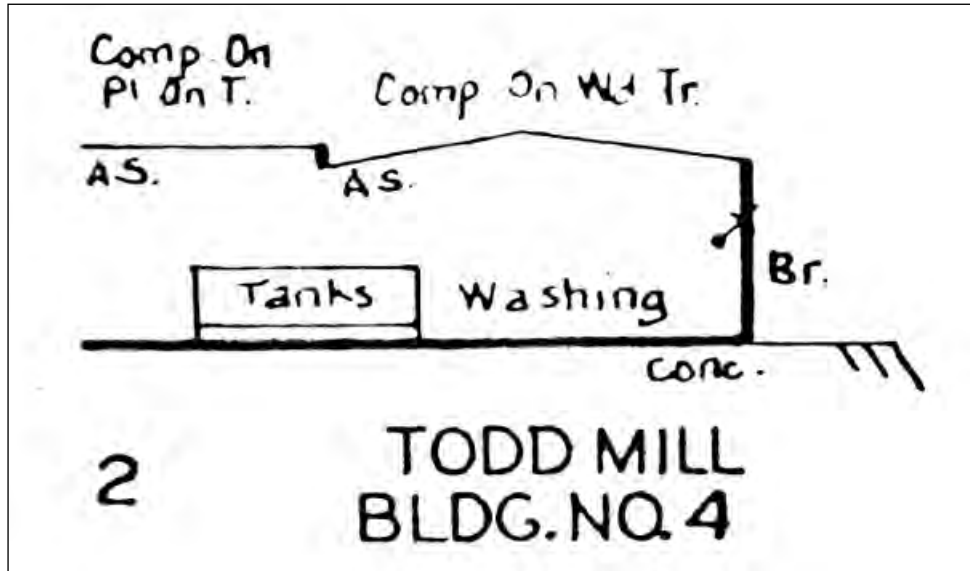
Factory Mutual Insurance Co. *Mill Realty Co.* 1965. West-east cross-section through Todd Building No. 4. Scale: 1 inch= 10 feet (approximately).
